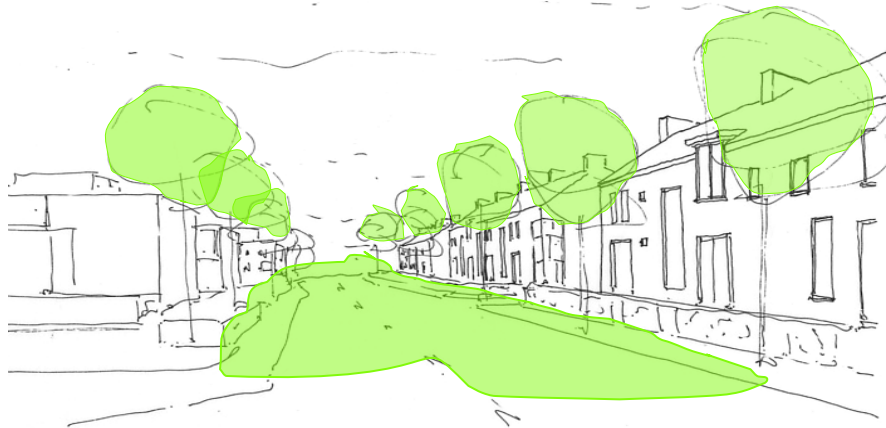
D | Indicative Perspective View of New Village Street
